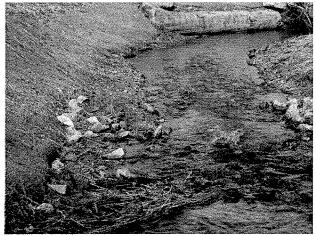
Looking downstream from culvert at log vane, root wads, and log toe protection installed between MC Stations 13+66 and 15+85. (4/7/04)
